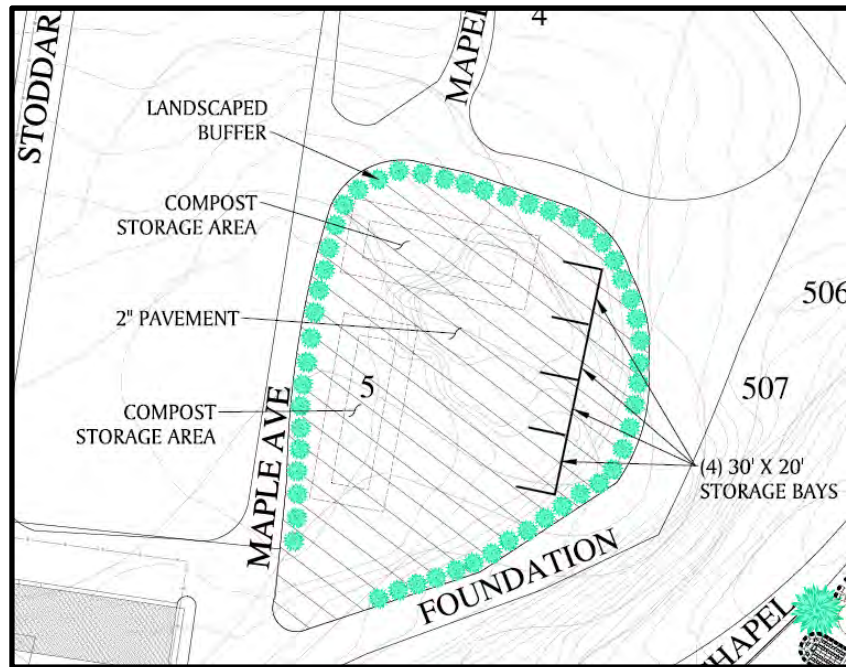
Plan View of Storage Area Improvements Adjacent to Maintenance Barn
